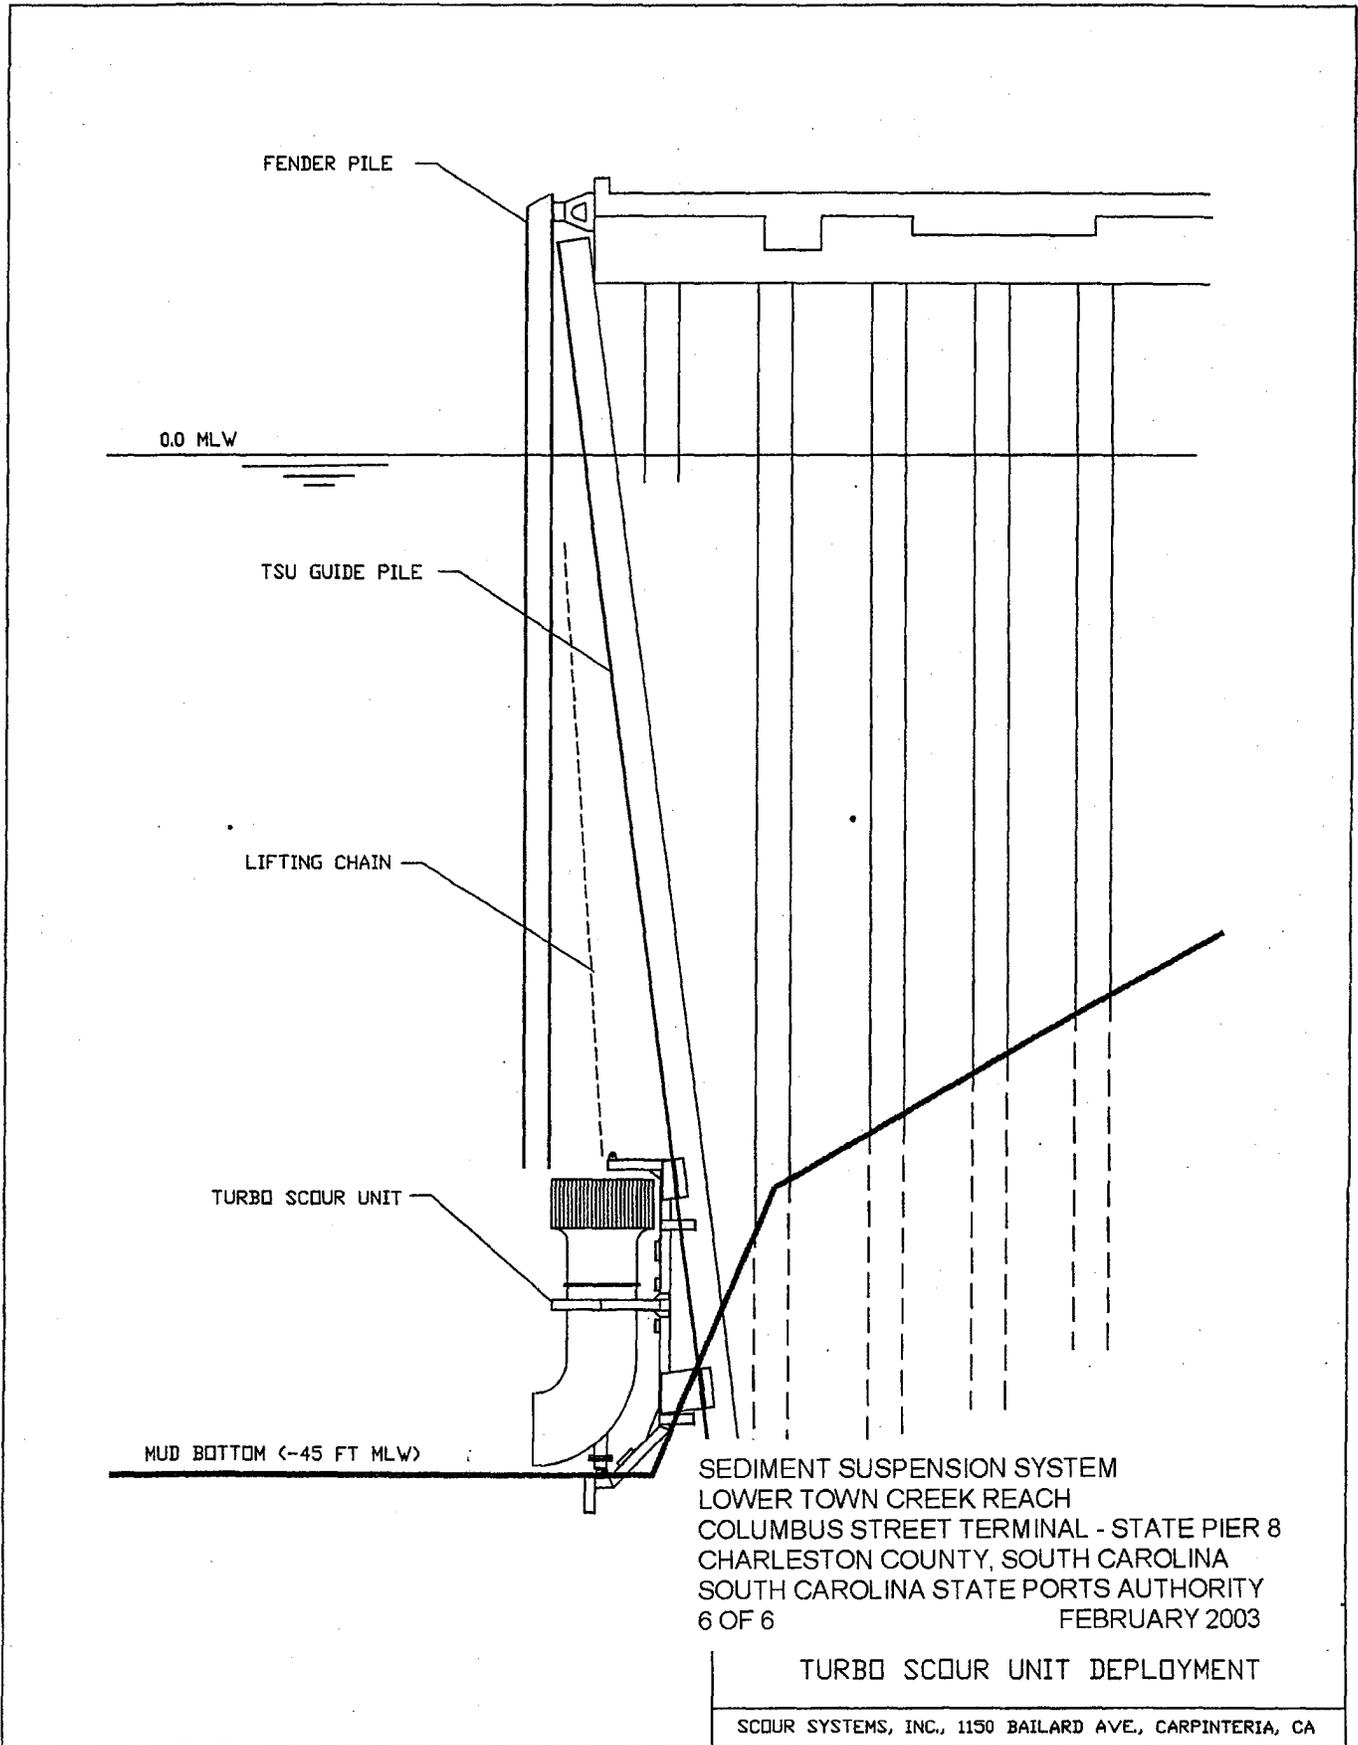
Elevation view of Turbo Scour unit deployed underwater on battered guide pile.
